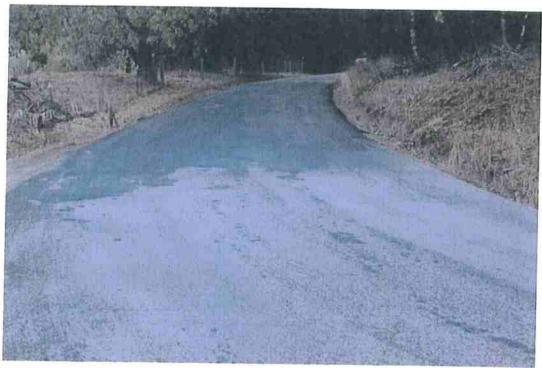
Mile 0.8: 30-ft road width with 1-ft shoulders.
